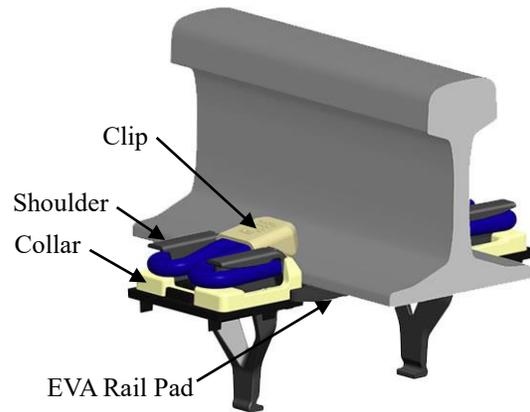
Pandrol Fasclip fastening system used on St. Louis MetroLink and drawing where components are identified
